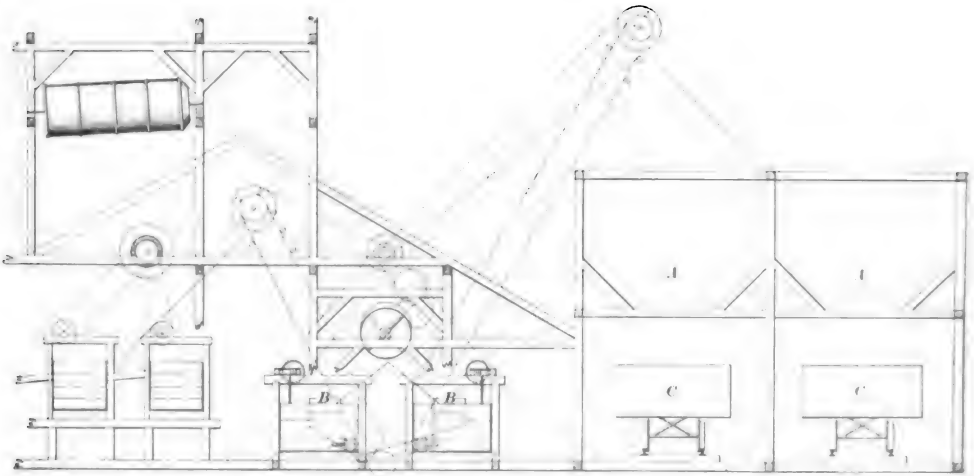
WALBURN-SWENSON WASHER, COAHUILA COAL CO.—LONGITUDINAL SECTION.
